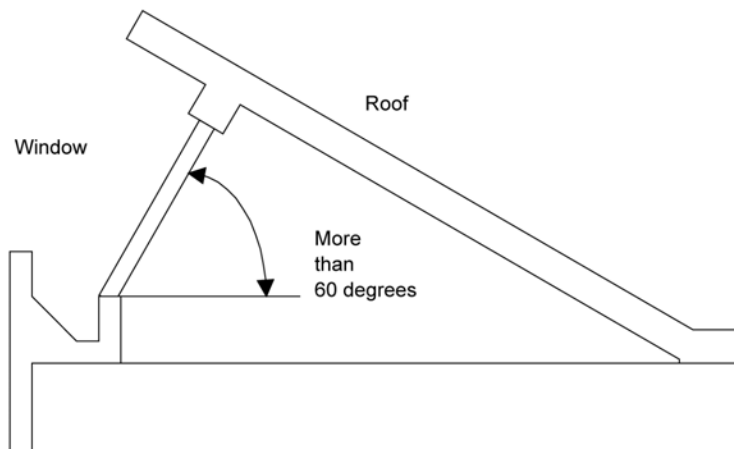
Slope of a Wall or Window (Roof or Skylight slope is less than 60°)
